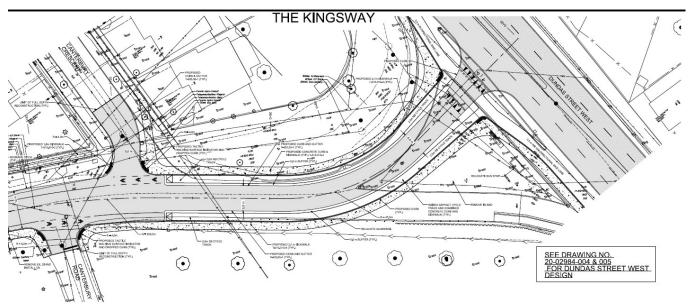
The design drawing for the proposed intersection improvements at The Kingsway and Dundas Street W.
